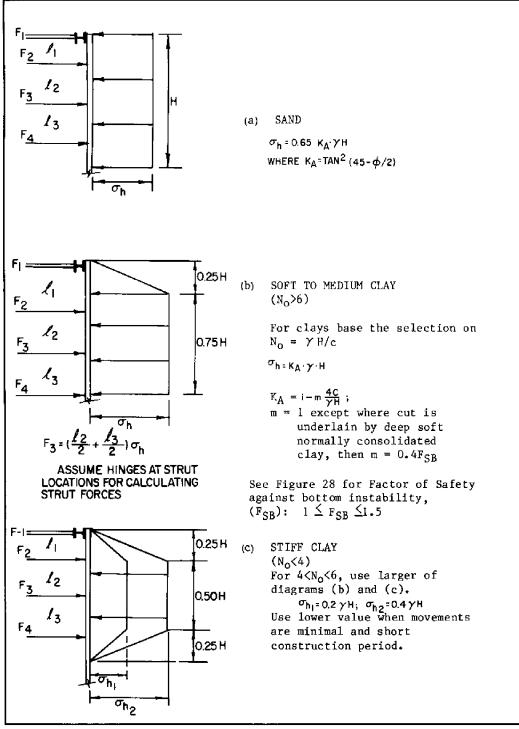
Pressure Distribution for Brace Loads in Internally Braced Flexible Walls
